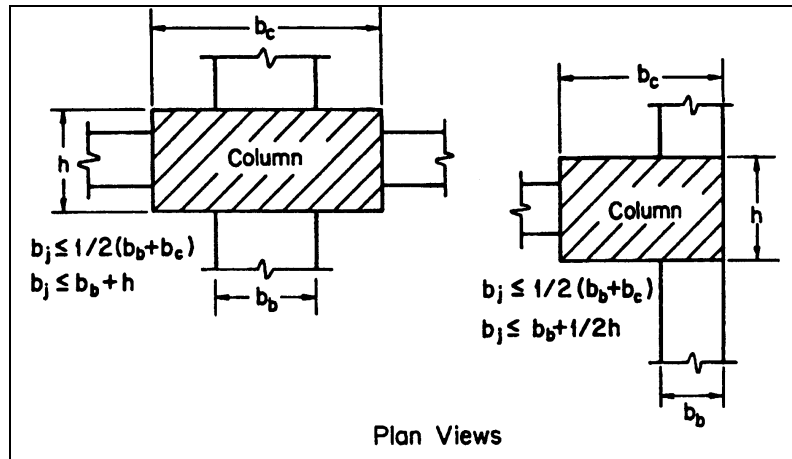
Definition of Effective Width for Reinforced Concrete Joint
